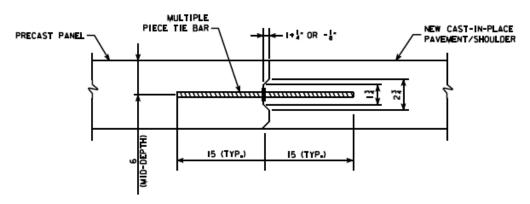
Connection to paving section (Merritt et.al, 2007)
